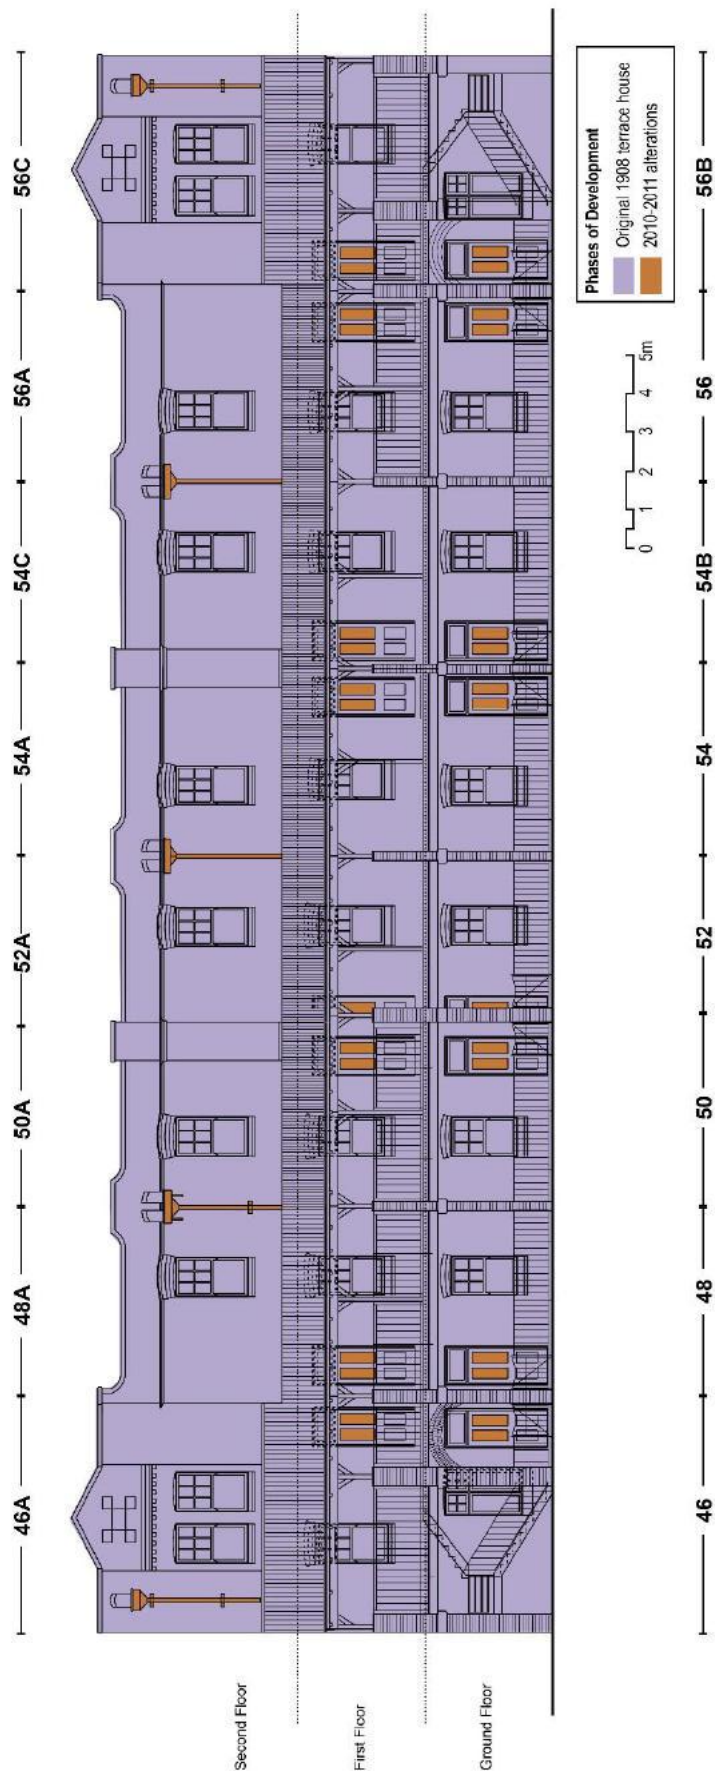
Diagram showing periods of construction—Gloucester Street (west) elevation. (Source: LAHC, with GML overlay 2016)
